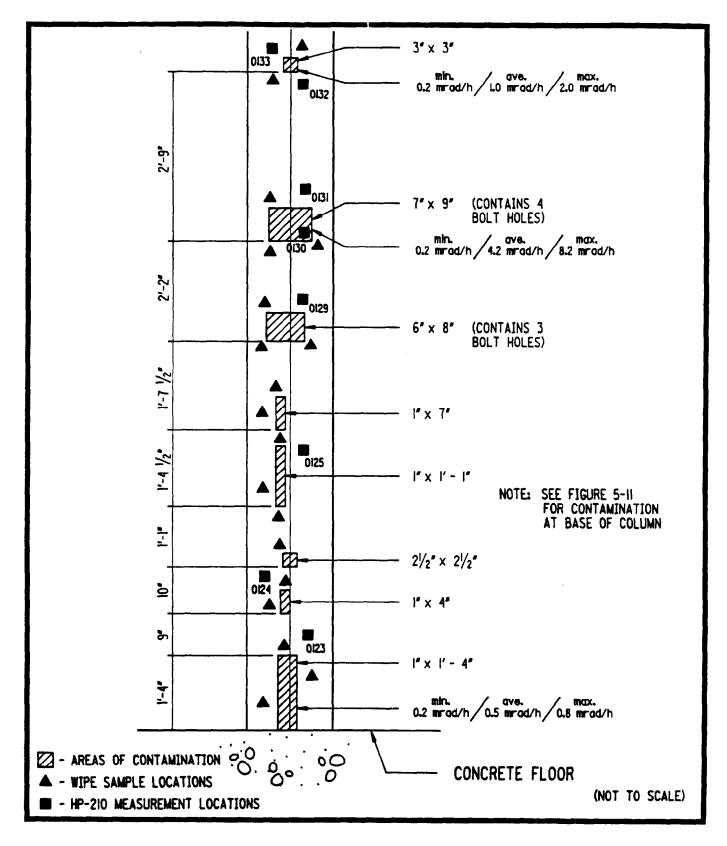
AREAS OF CONTAMINATION - COLUMN 2, NORTH FACE (ROOM 1, FIRST FLOOR)
